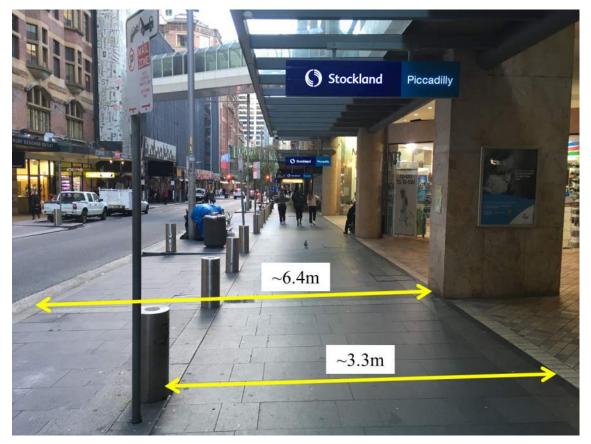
Castlereagh Street, looking north, adjacent to proposed development site
